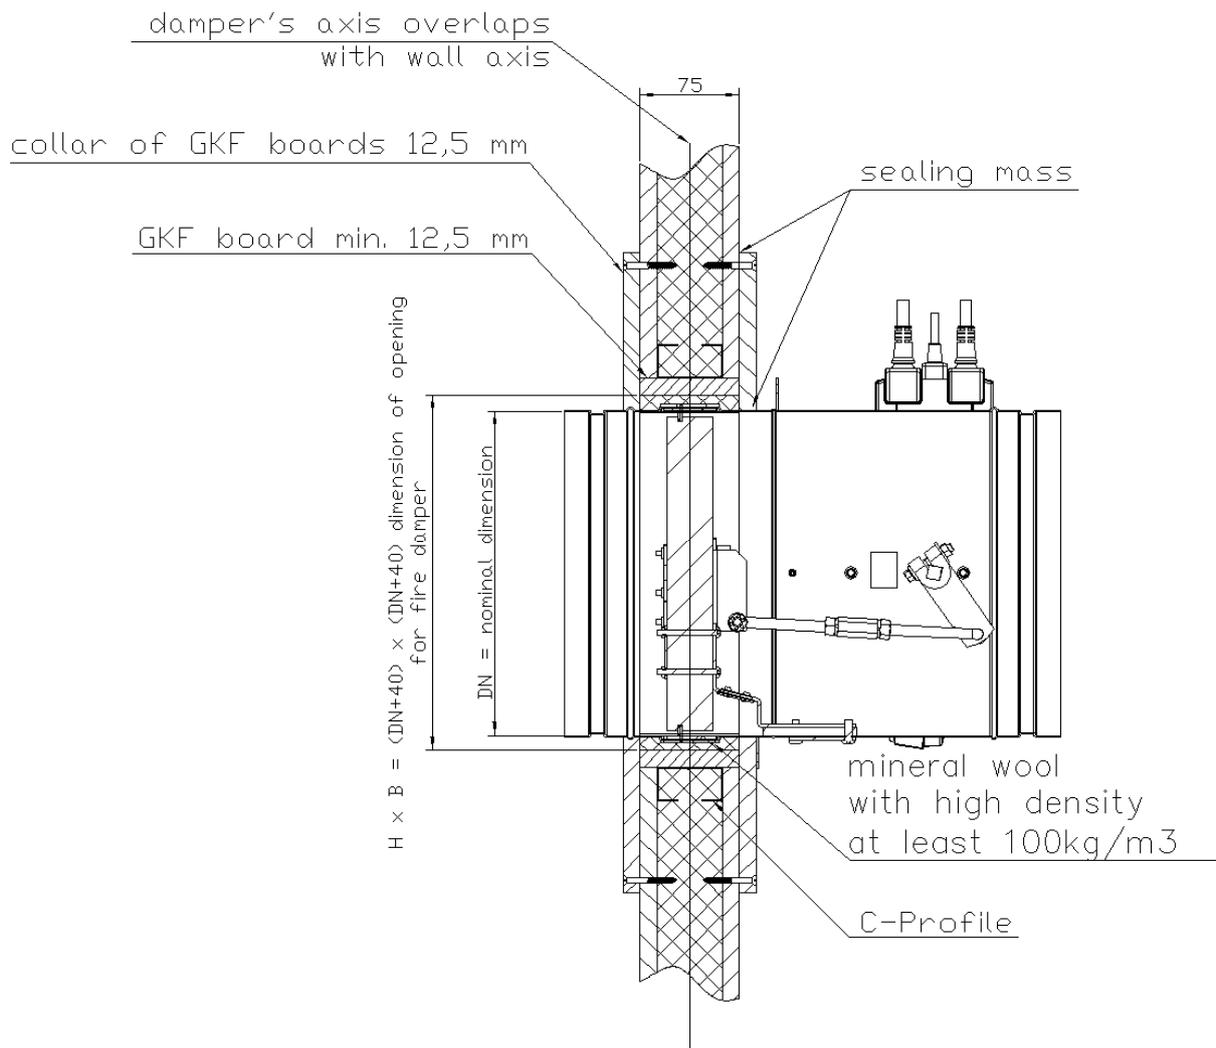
Installation of KTS-O in flexible wall construction with 75 [mm] thickness
